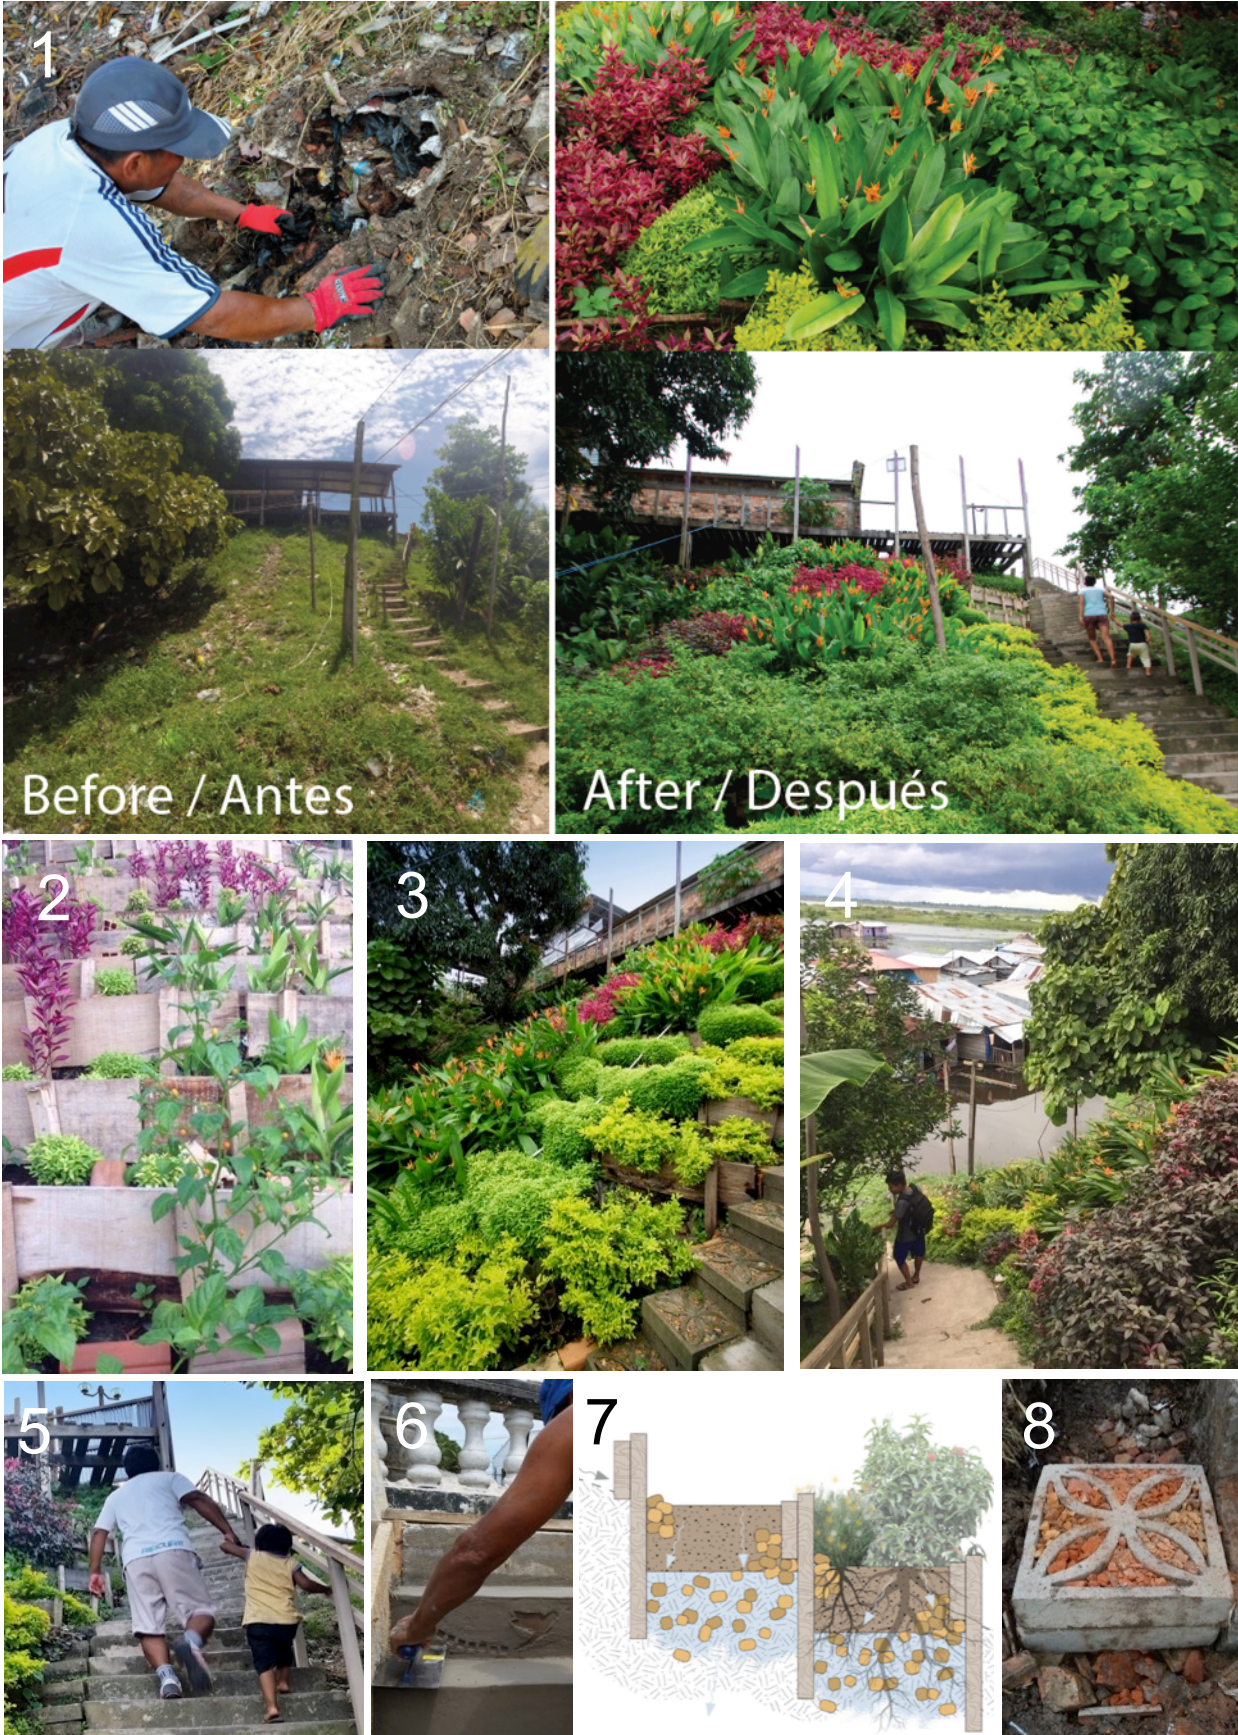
Details of the Community Entrance Garden including 1) before and after images, 2) infrastructure details, 3) six months and 4) 18 months after construction, 5-6) stairs details, and 7-8) infiltration details.
